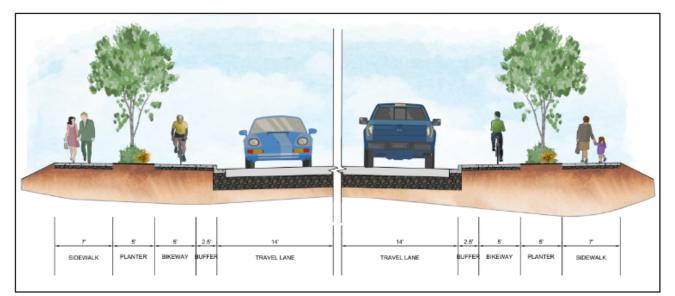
Elevated Bikeway and Sidewalk Alternative (MM5).
